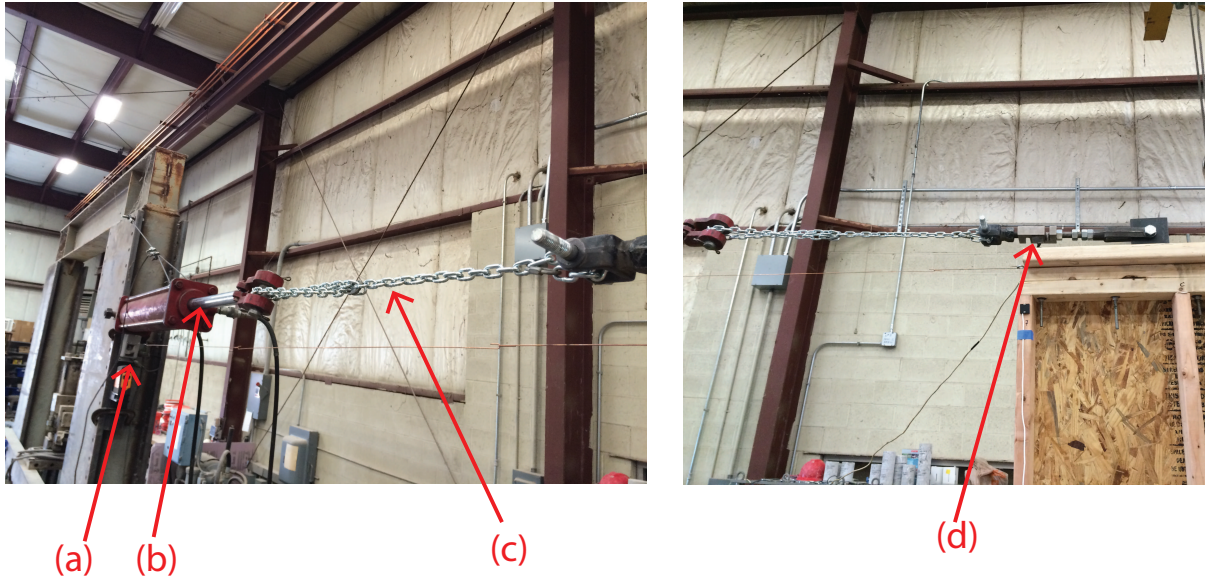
The lateral loading system for the timber wall: (a) wire potentiometer for measuring displacement; (b) hydraulic arm for applying lateral force; (c) adjustable chain for transferring lateral force and allowing slack during disengagement of loading system, and (d) s-shaped load cell for measuring applied force
